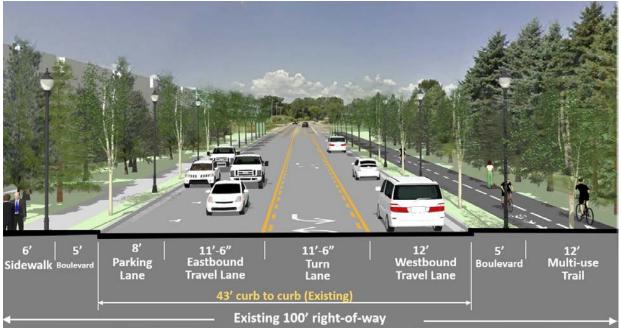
4TH STREET N. (LOOKING WEST)
